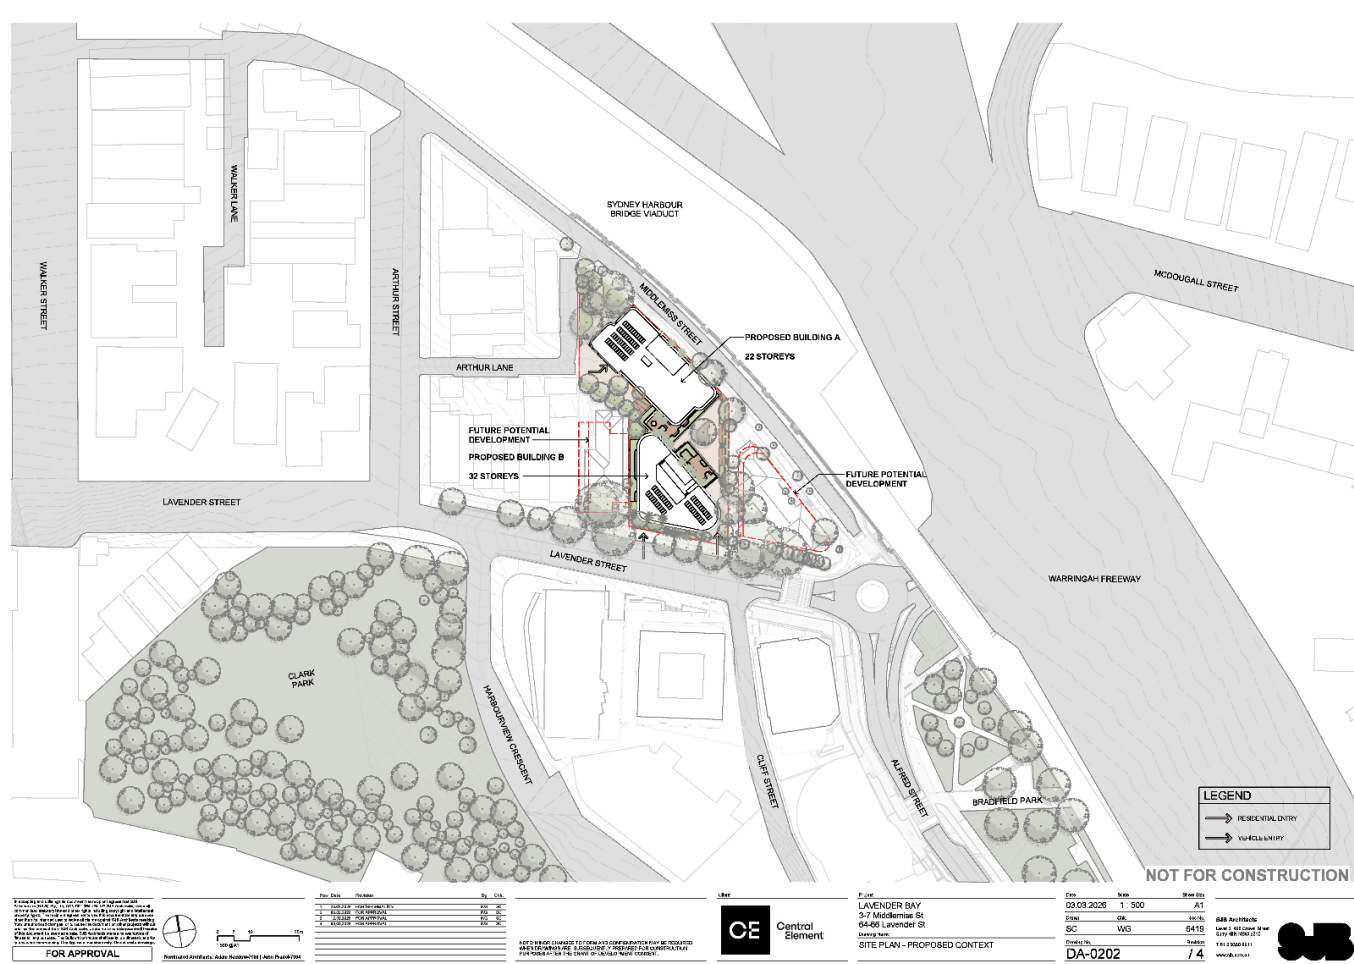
Proposed site context plan, SJB Architects, 3 March 2026, DA-0202.
